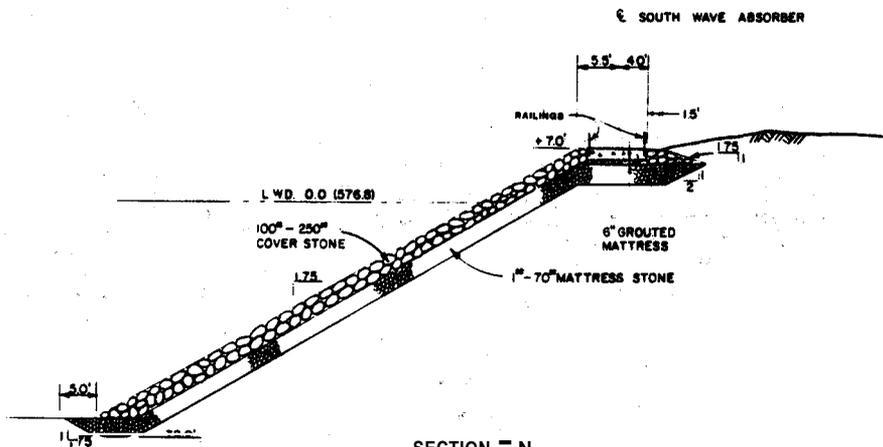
Typical breakwater cross sections, Ludington Harbor, Michigan
